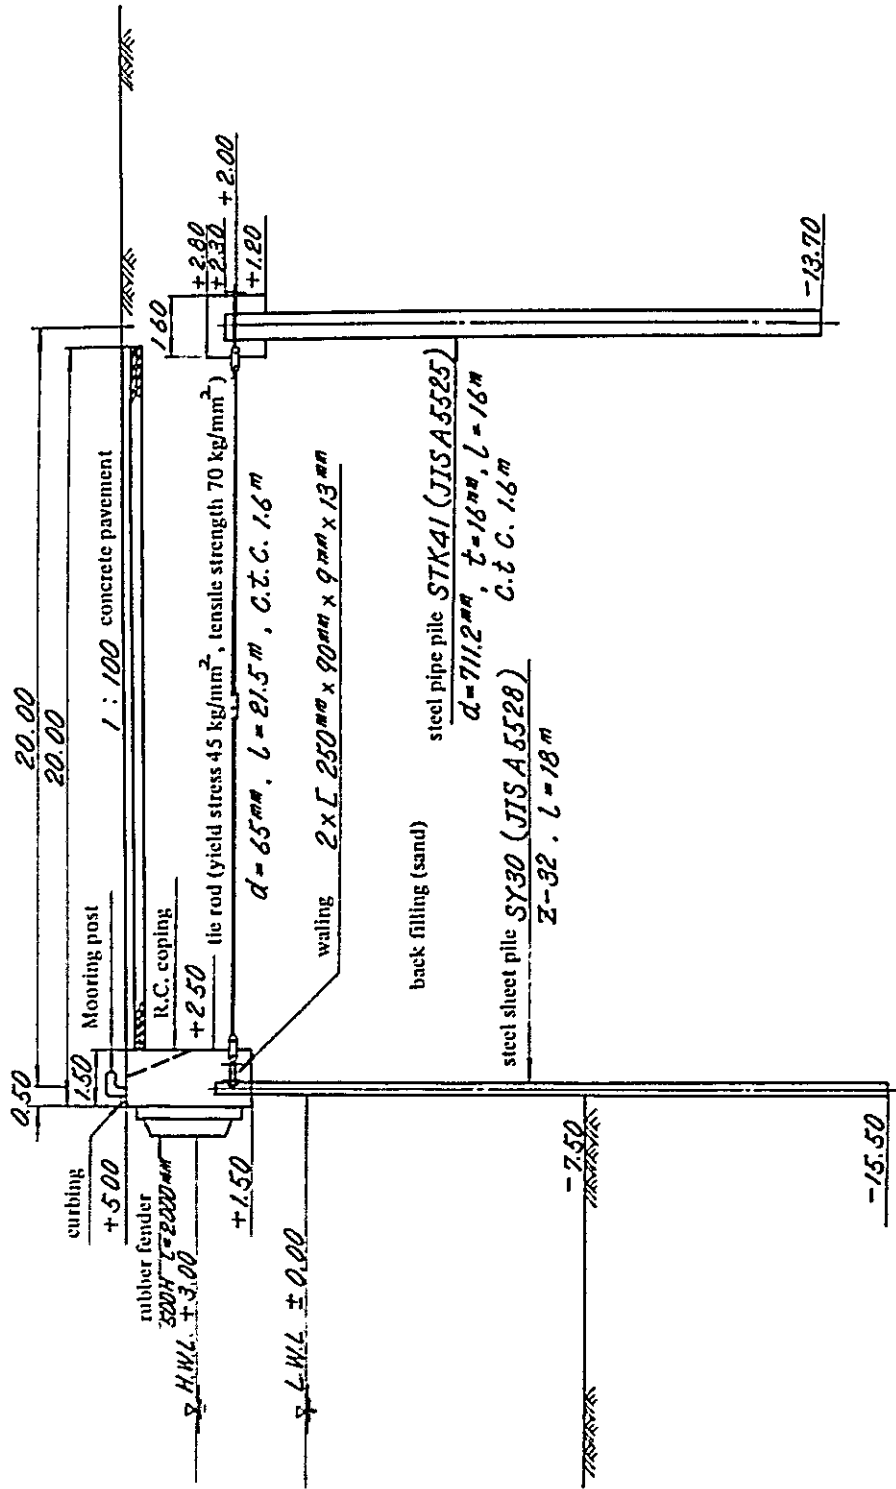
Standard Cross Section of -7.5m Quay Wall (South Caldera)
